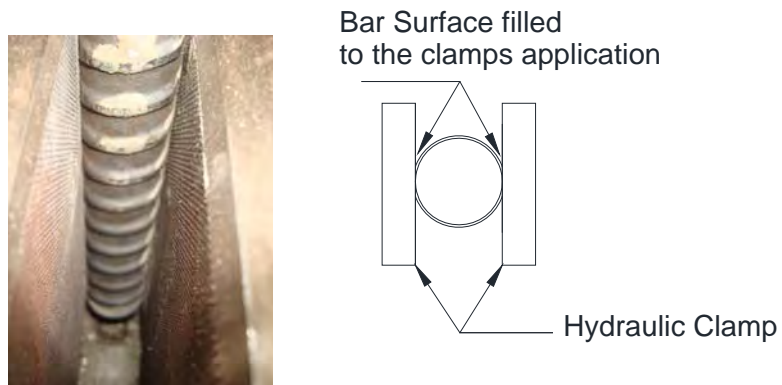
Bar preparation for clamping into the universal compression tension machine
